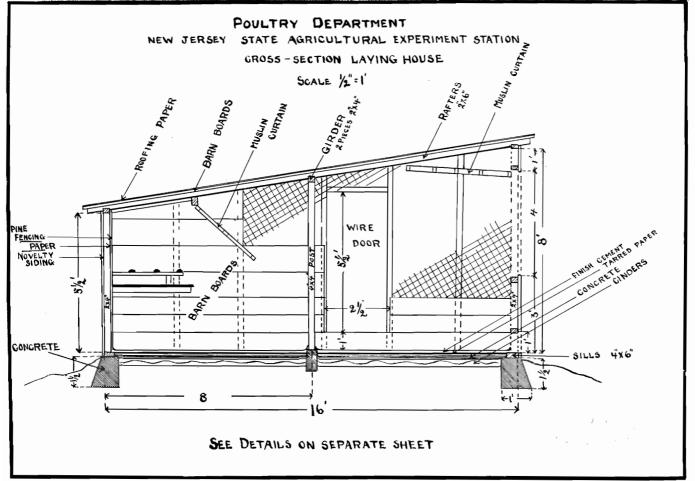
Cross-section of laying house giving details of construction. This type of building may be used for one or two pen houses or may be extended indefinitely to make a long laying house.
